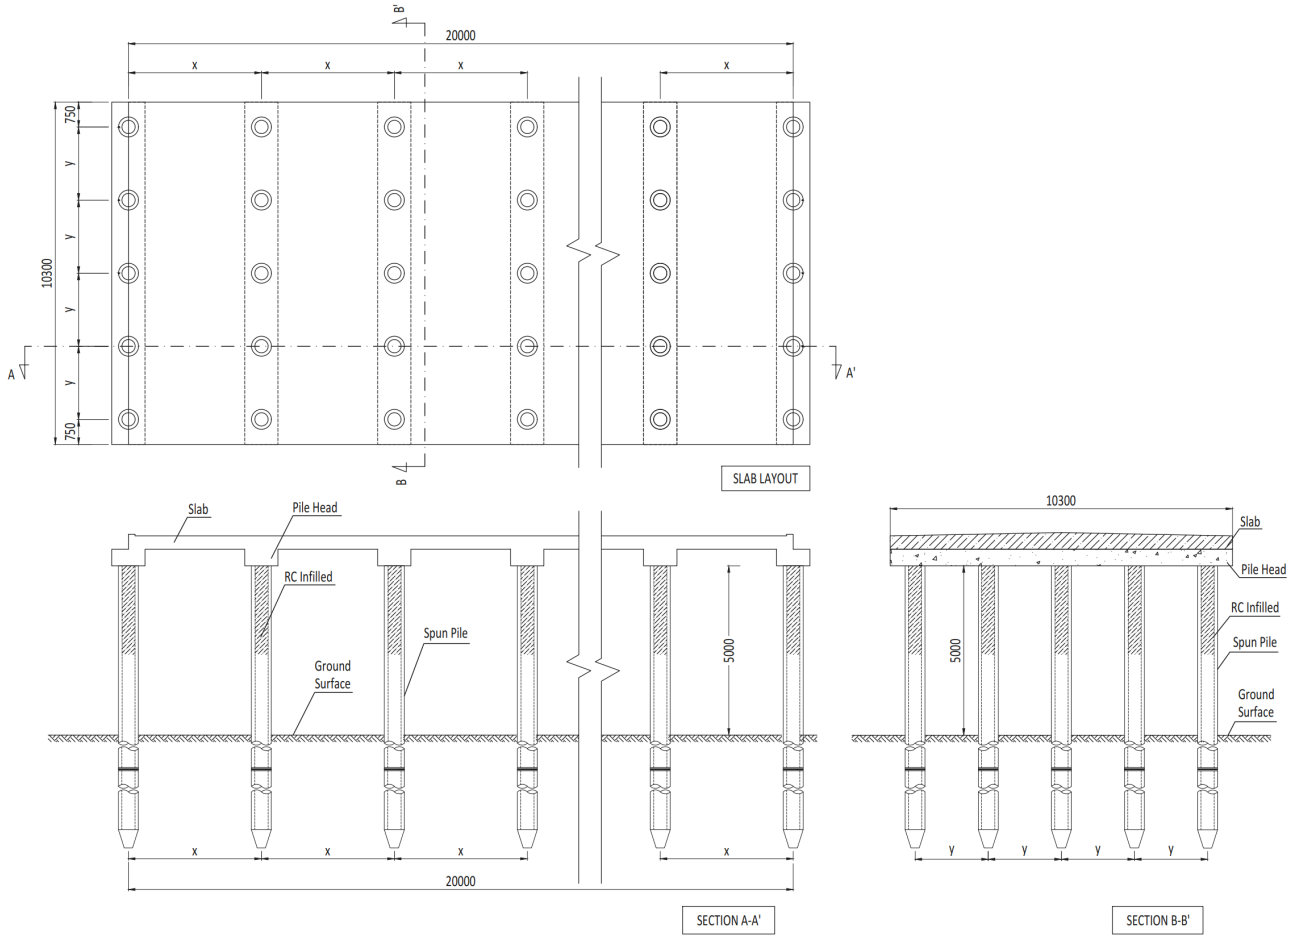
Typical configuration of a single SOP structure segment (unit in mm)
